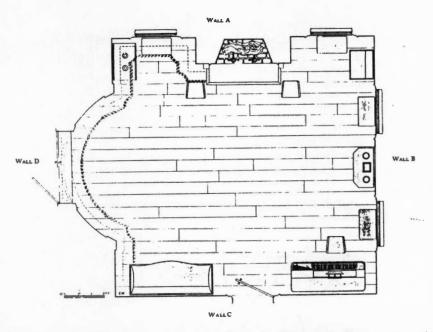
Layout of furniture in an 1820 Greek Revival parlor.
